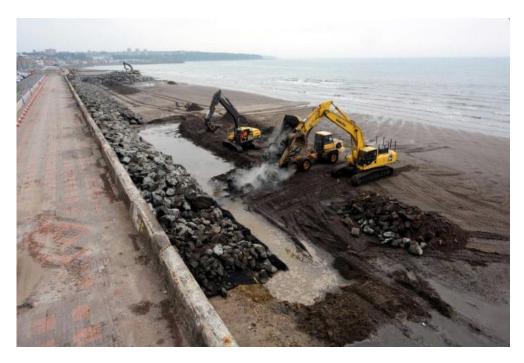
Kirkcaldy Sea Wall – Rock Revetment Construction. Photo Courtesy VolerWessels UK
